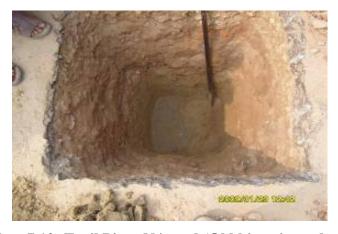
Trail Pit at N4 road (Old bituminous layer below ISG)
